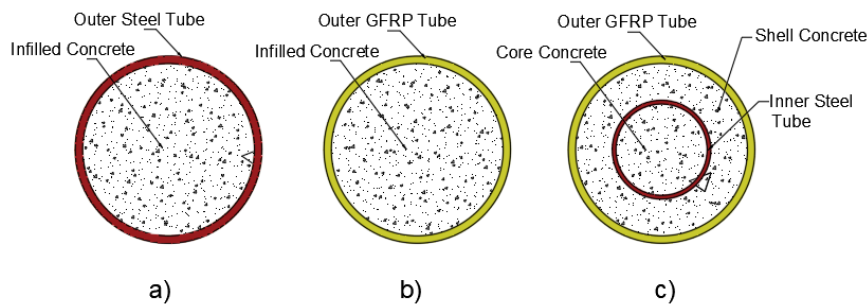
Concrete filled Steel tube column CFST b) Concrete filled GFRP tube column CFFT c) Concrete filled Double section (GFRP outer & steel inner tube) CFDTS column
